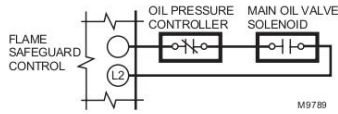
Hookup of an oil pressure controller used on a single burner system with an integral oil pump.
